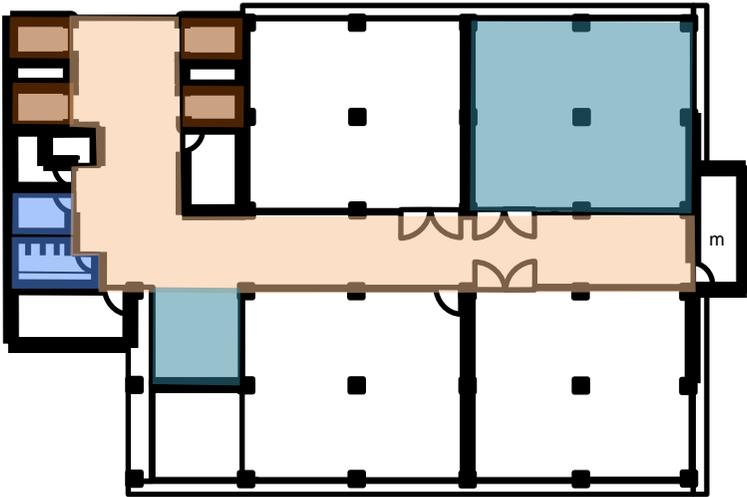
Typical Layout of 16th, 17th, and 18th Floor.
